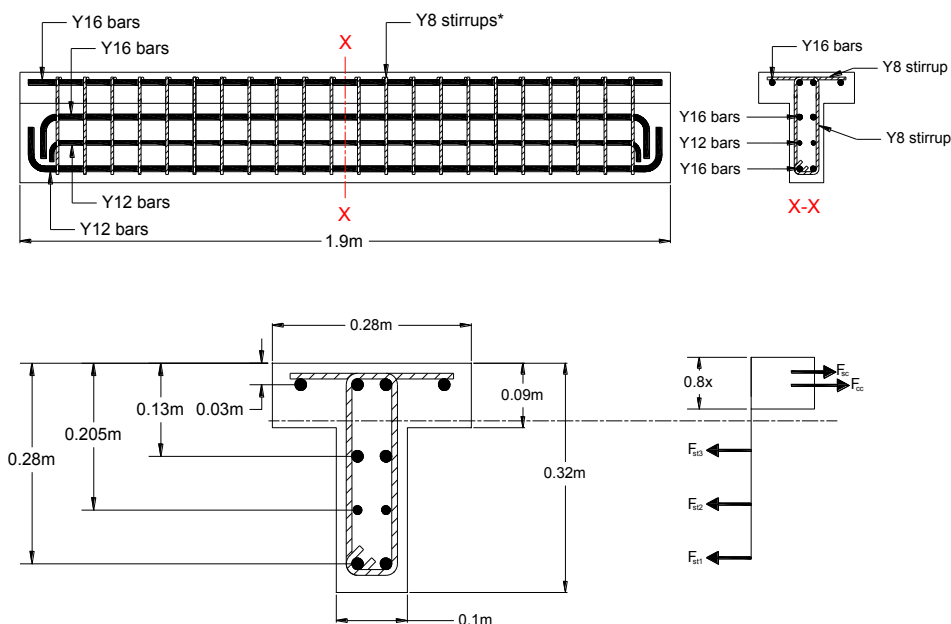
T-Beam dimensions and reinforcement layout (stirrup spacing varies)
